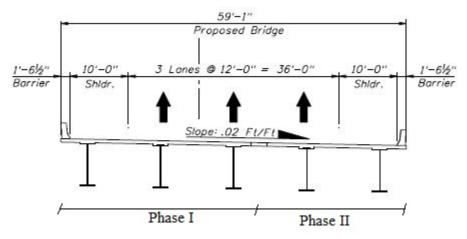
Cross-section of the bridge I-95 over SR-421
